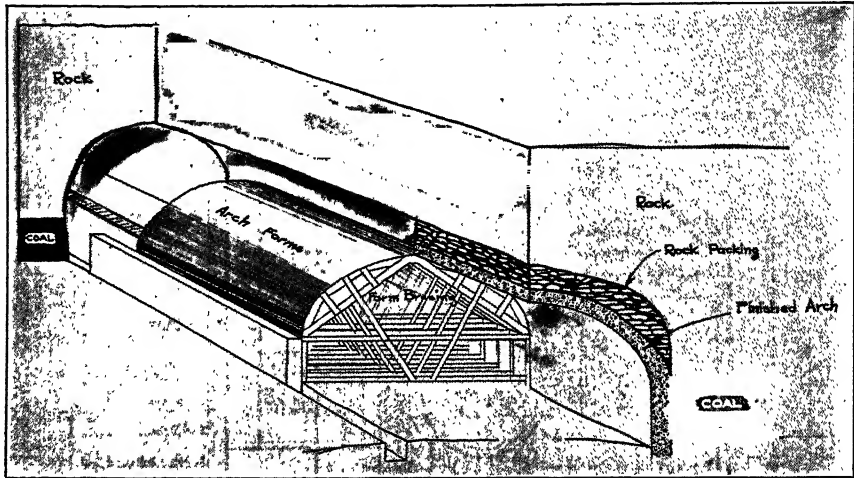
ARCH FORMS, CONCRETING, PACKING, ETC.
